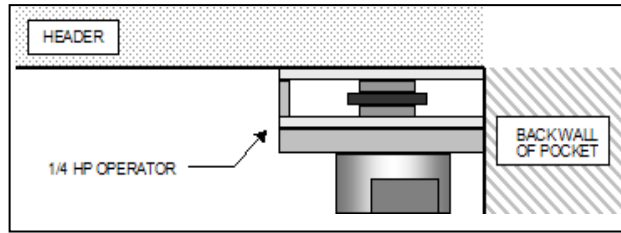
Spacing of 1/4 HP Operator Mount in Pocket
